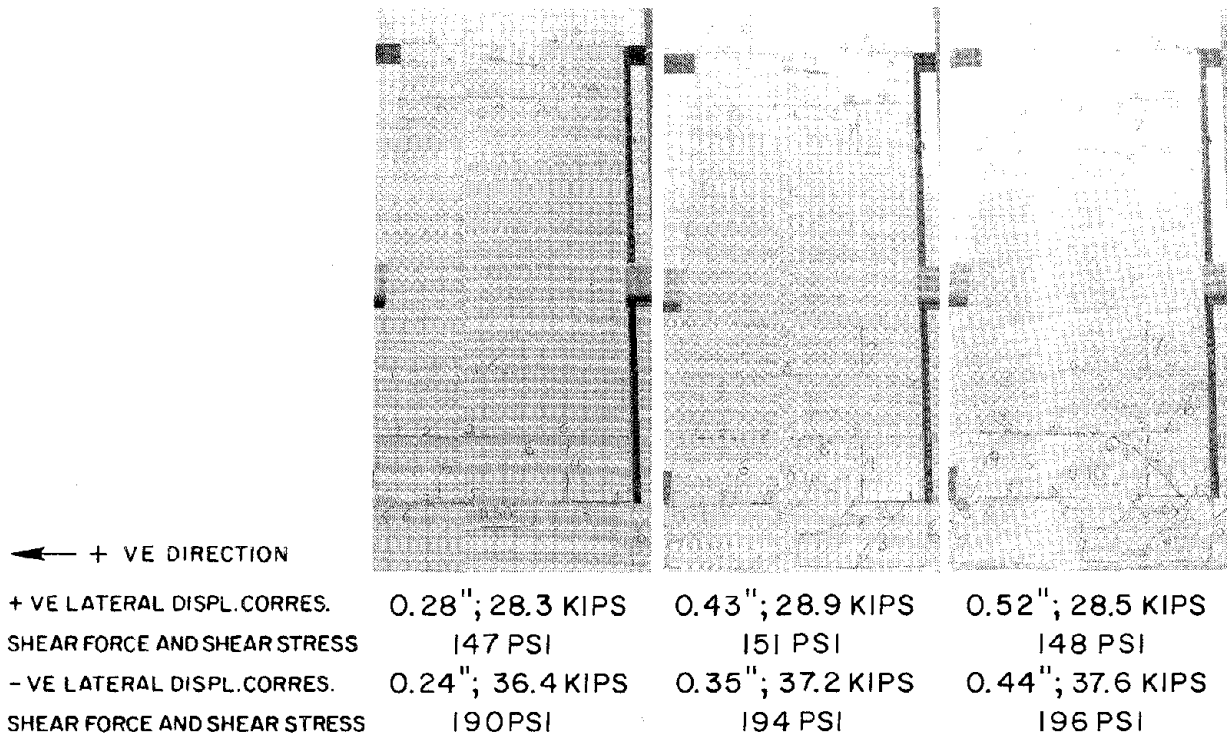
SUCCESSIVE CRACK FORMATION TEST 16. (RIGHT SIDE PIER)
